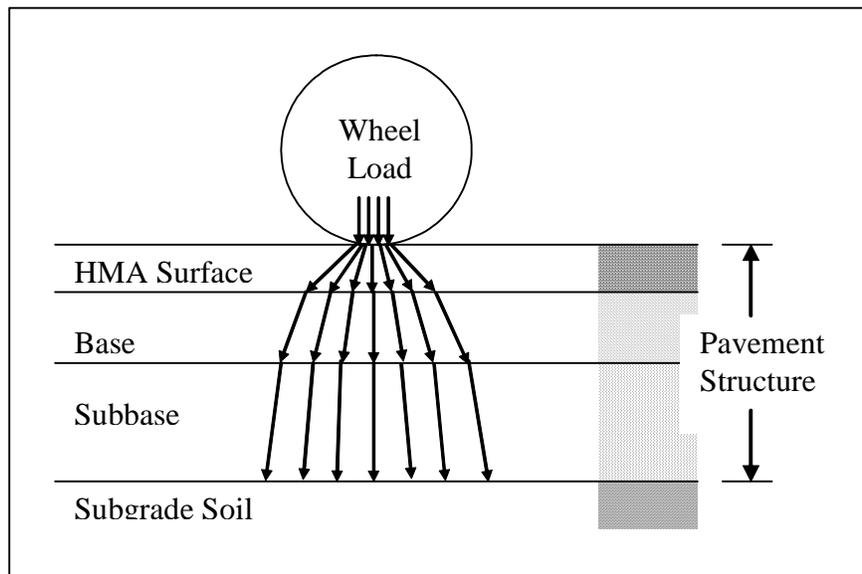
Typical flexible pavement structure and stress distribution (NHI, 2001)
